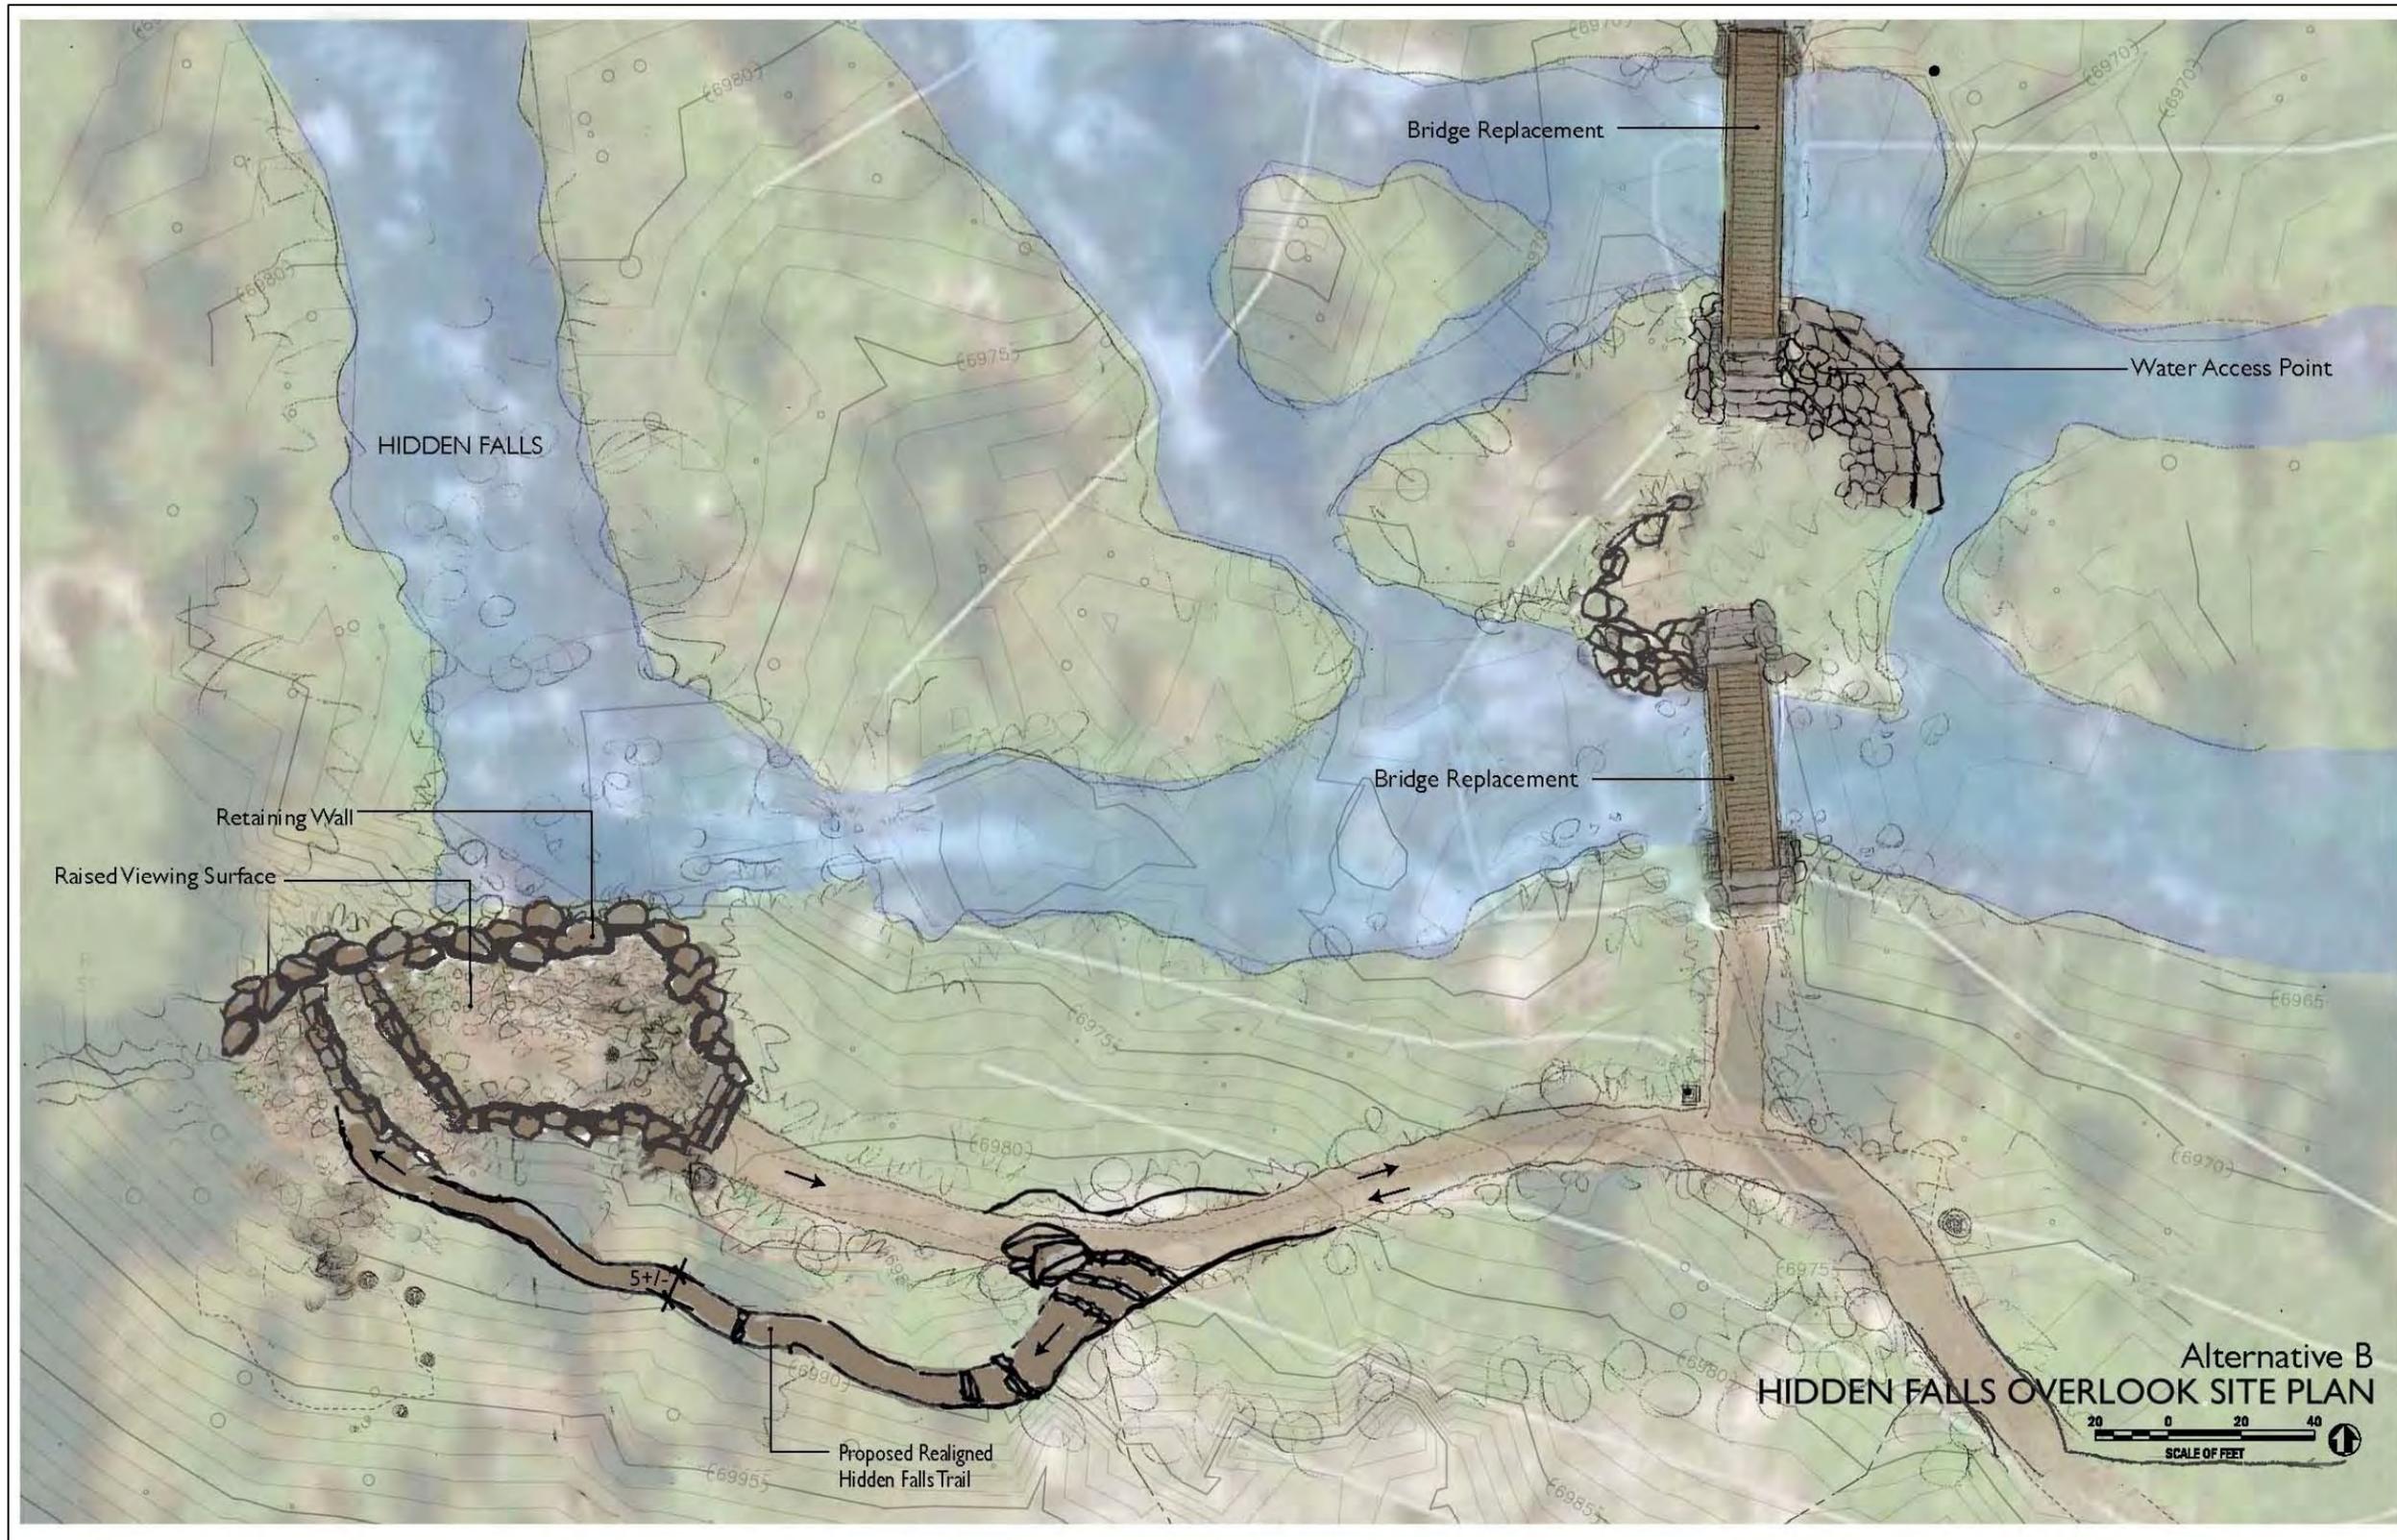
Alternative B, Hidden Falls Area Plan, Backcountry
